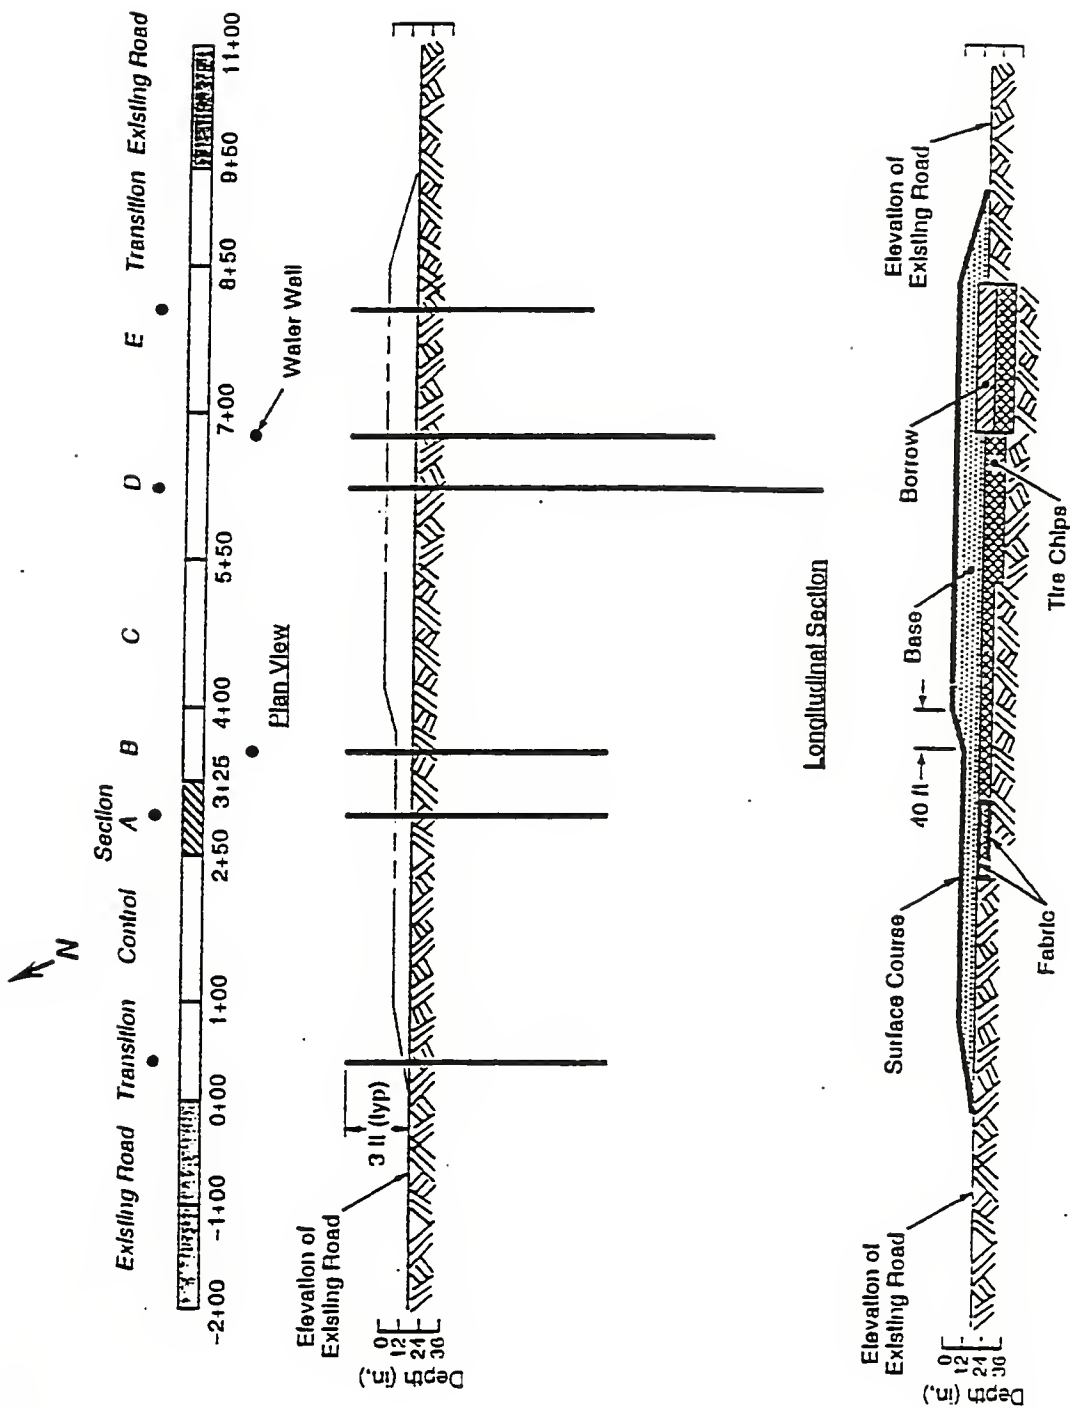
Dingley road test site (Humphrey and Katz, 1995)
